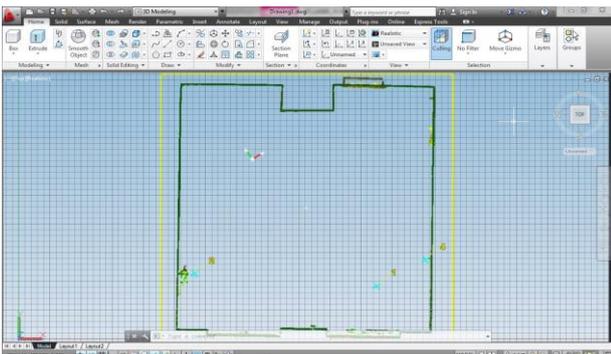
2D Floor plan of the lab exported in AutoCAD 2013
